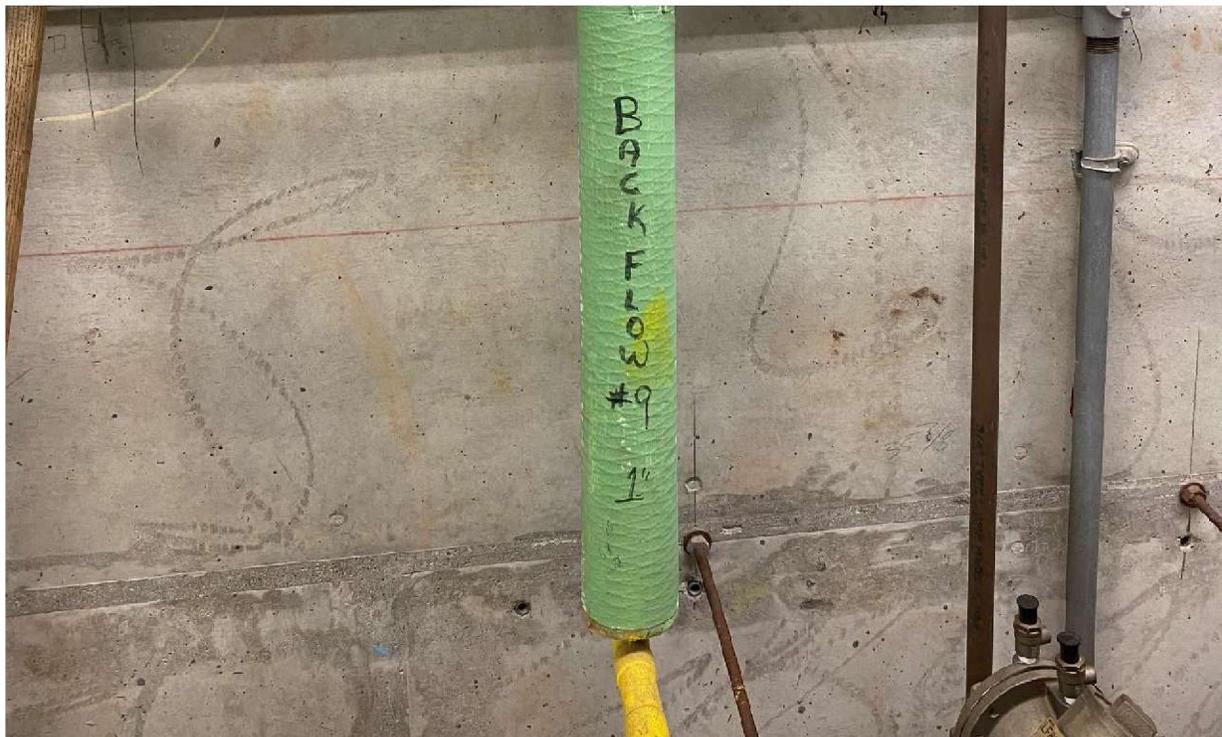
Backflow Pipe Green Jacket and Pipe Insulation
